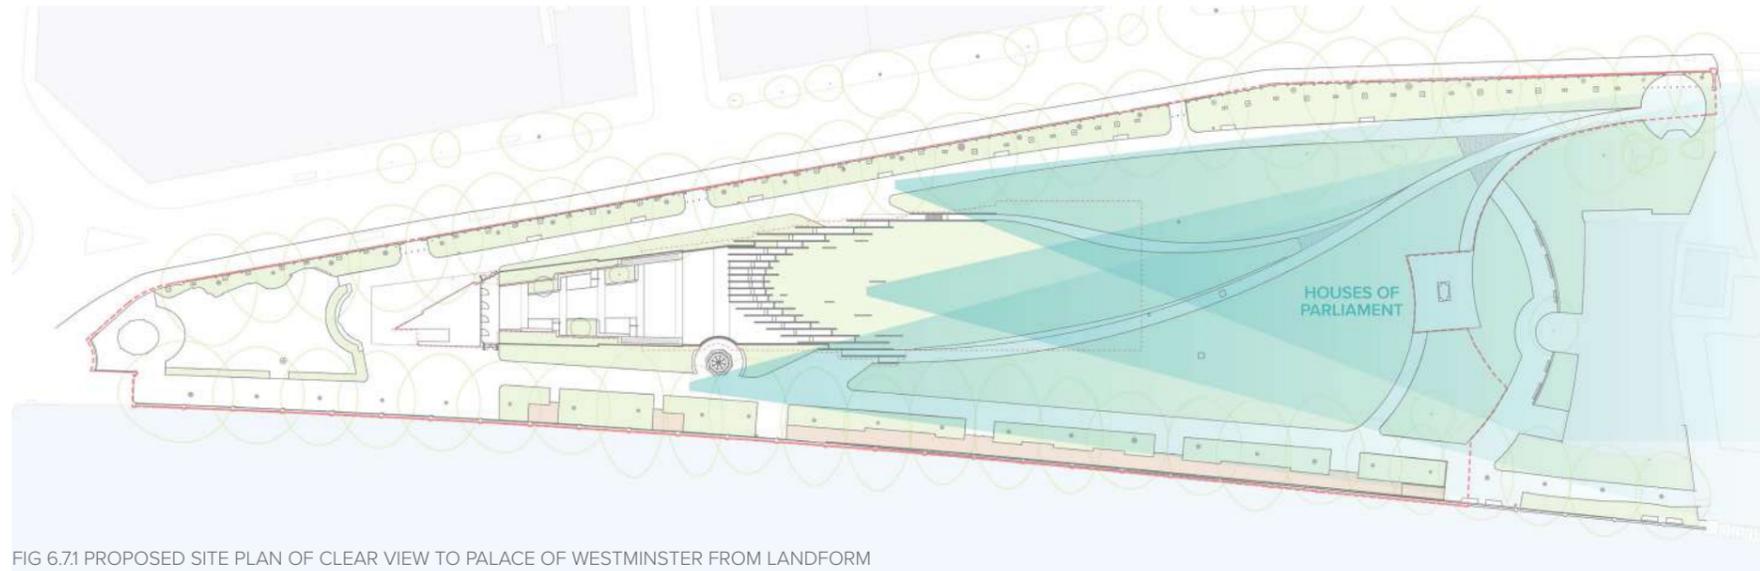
PROPOSED SITE PLAN OF CLEAR VIEW TO PALACE OF WESTMINSTER FROM LANDFORM
